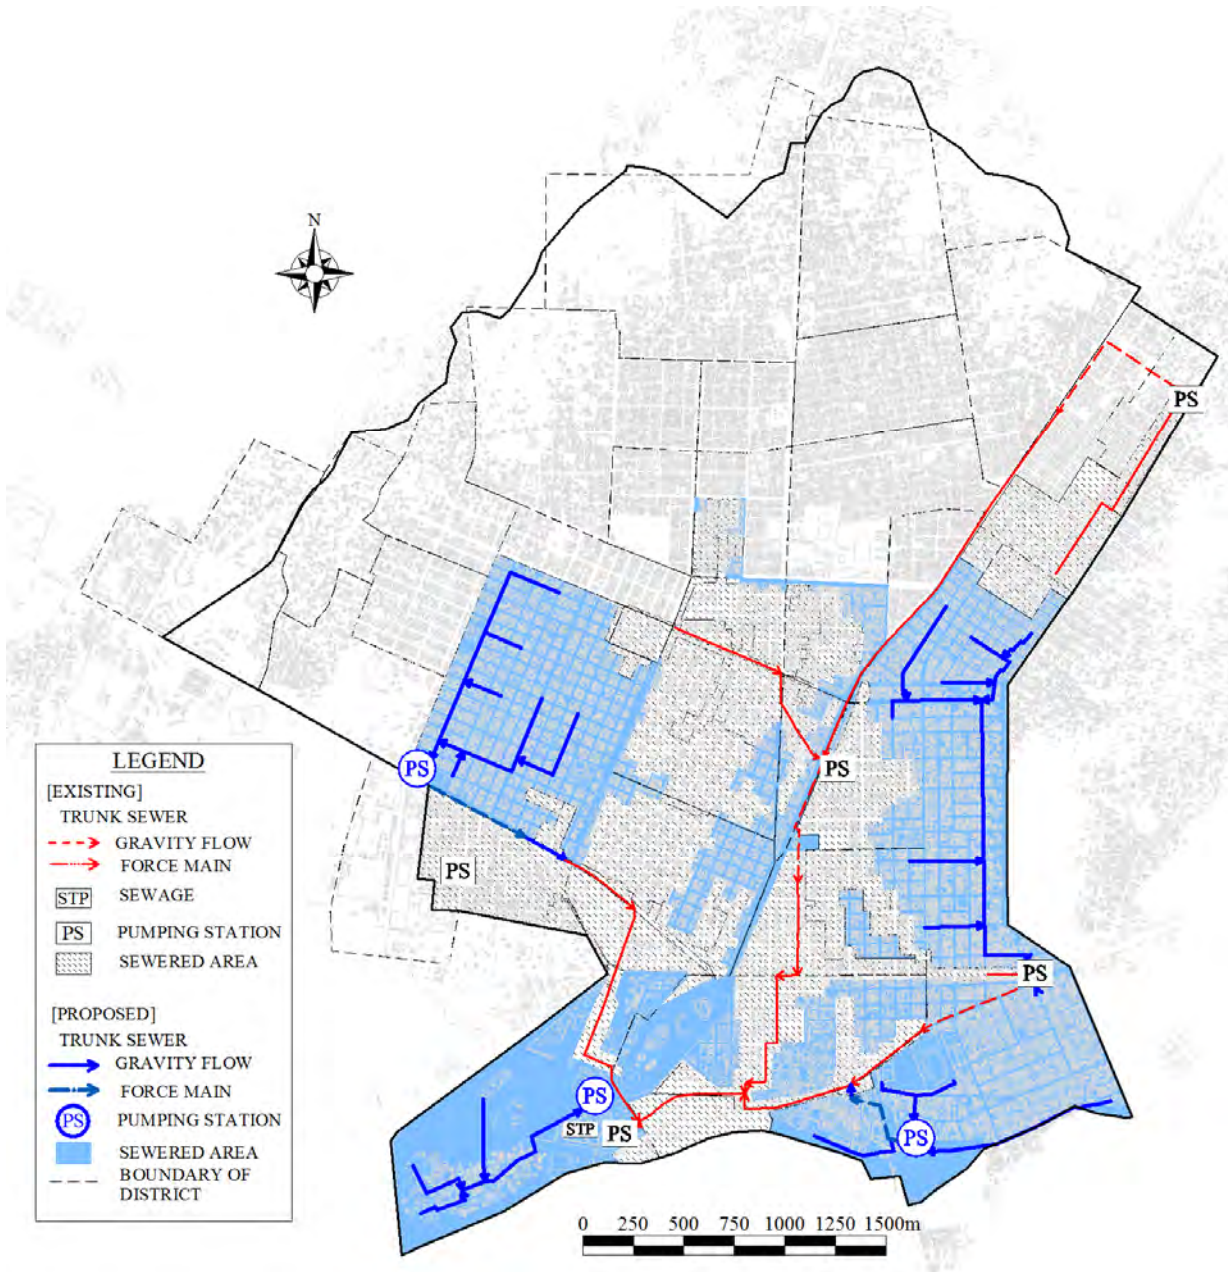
Layout Plan of Alternative 1 (Sewer Network)
